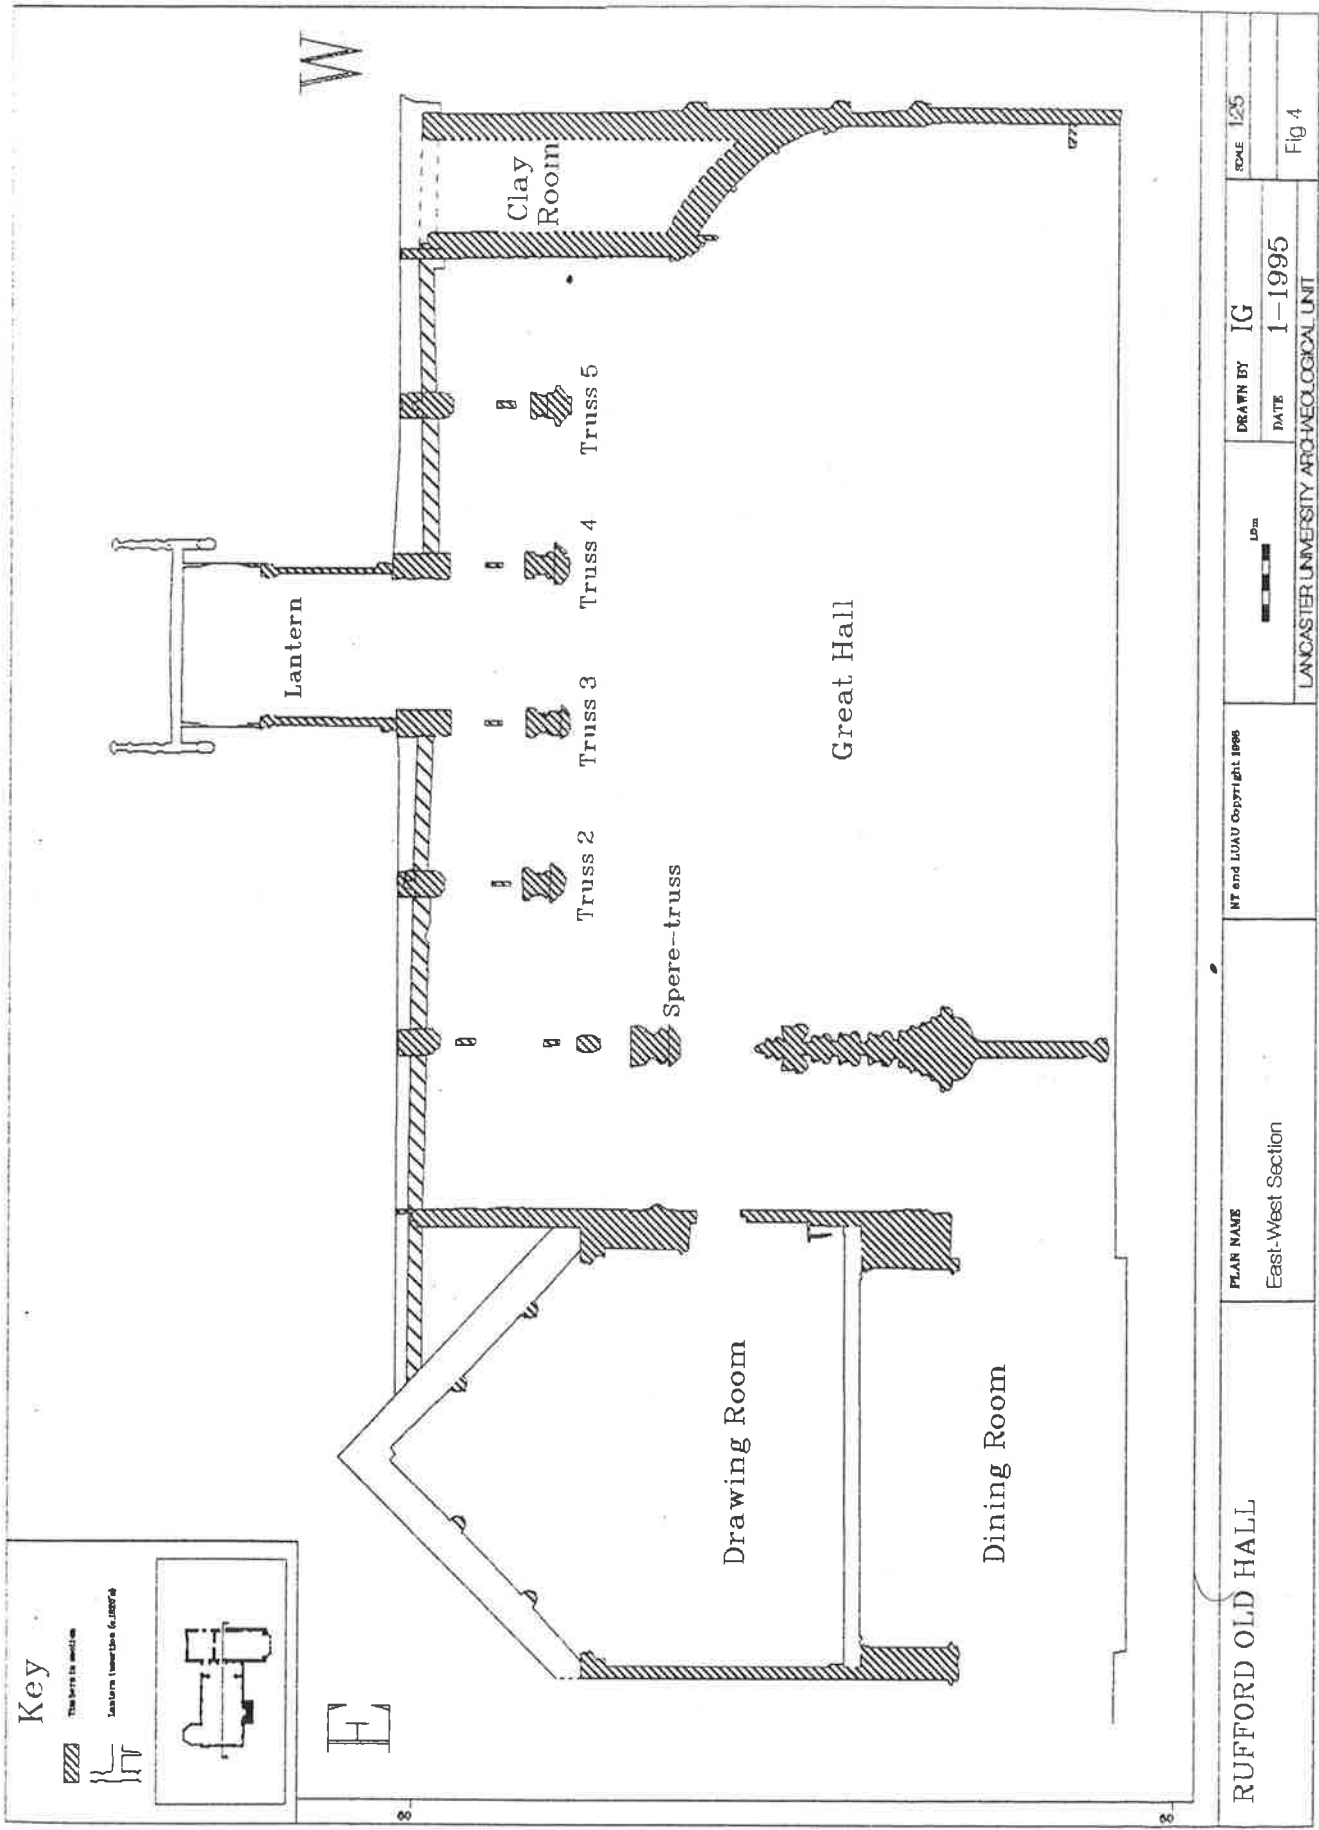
East-West Cross Section through Great Hall and Drawing Room Wing
